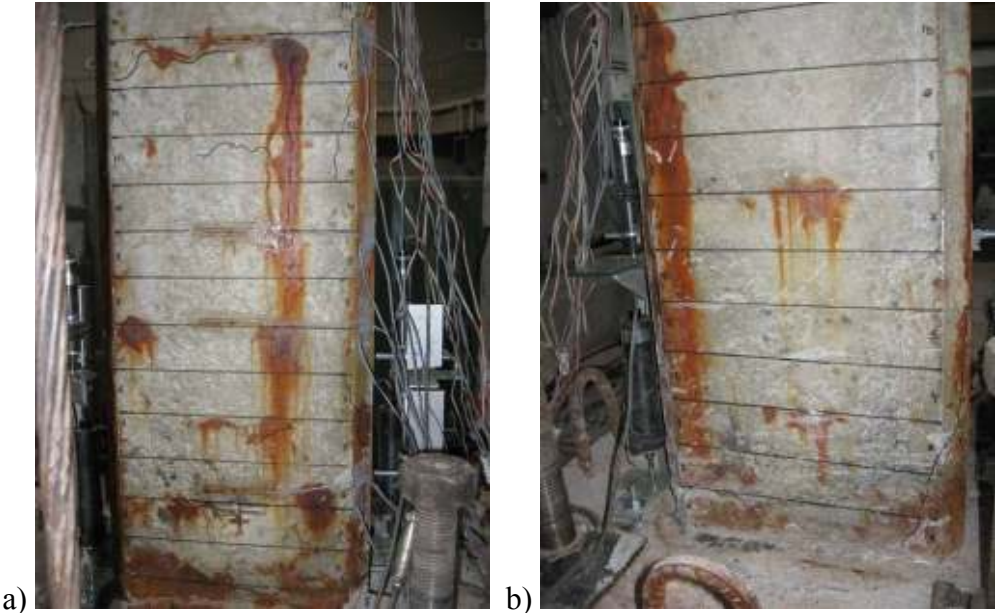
Pattern of cracks formed due to corrosion: (a) North, (b) South.
